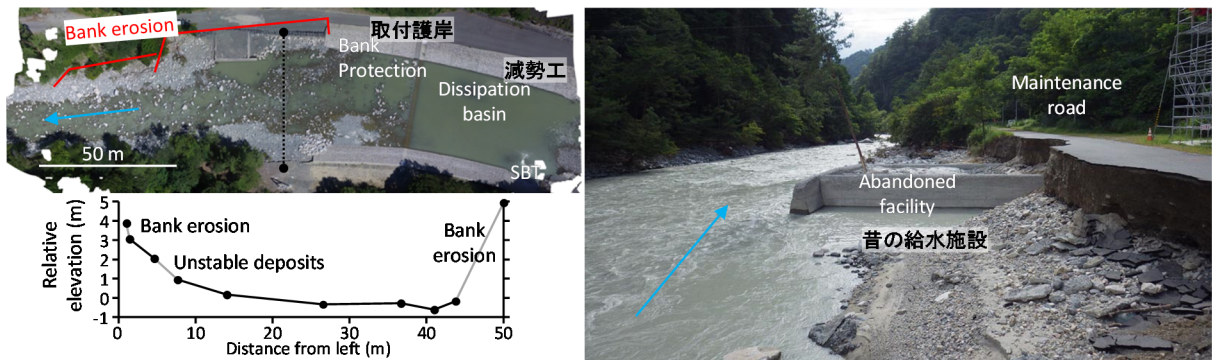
Plan view, cross-section, and close-up view of the road failure (bank erosion) 100m downstream from SBT outlet.
